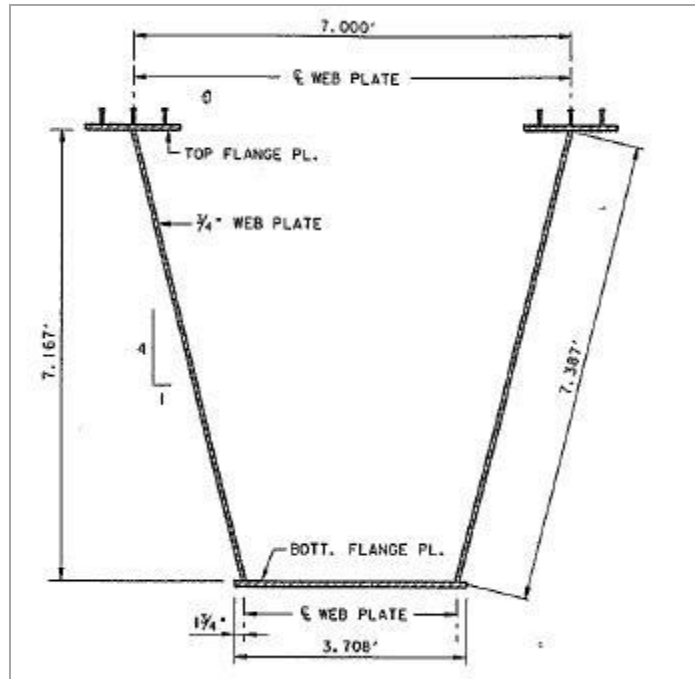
Typical cross-section of the steel girder of the Woodway Bridge Span 11
